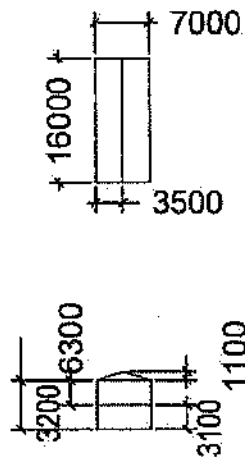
Plan and typical elevation for messroom/ ablutions (BLDG 921)
